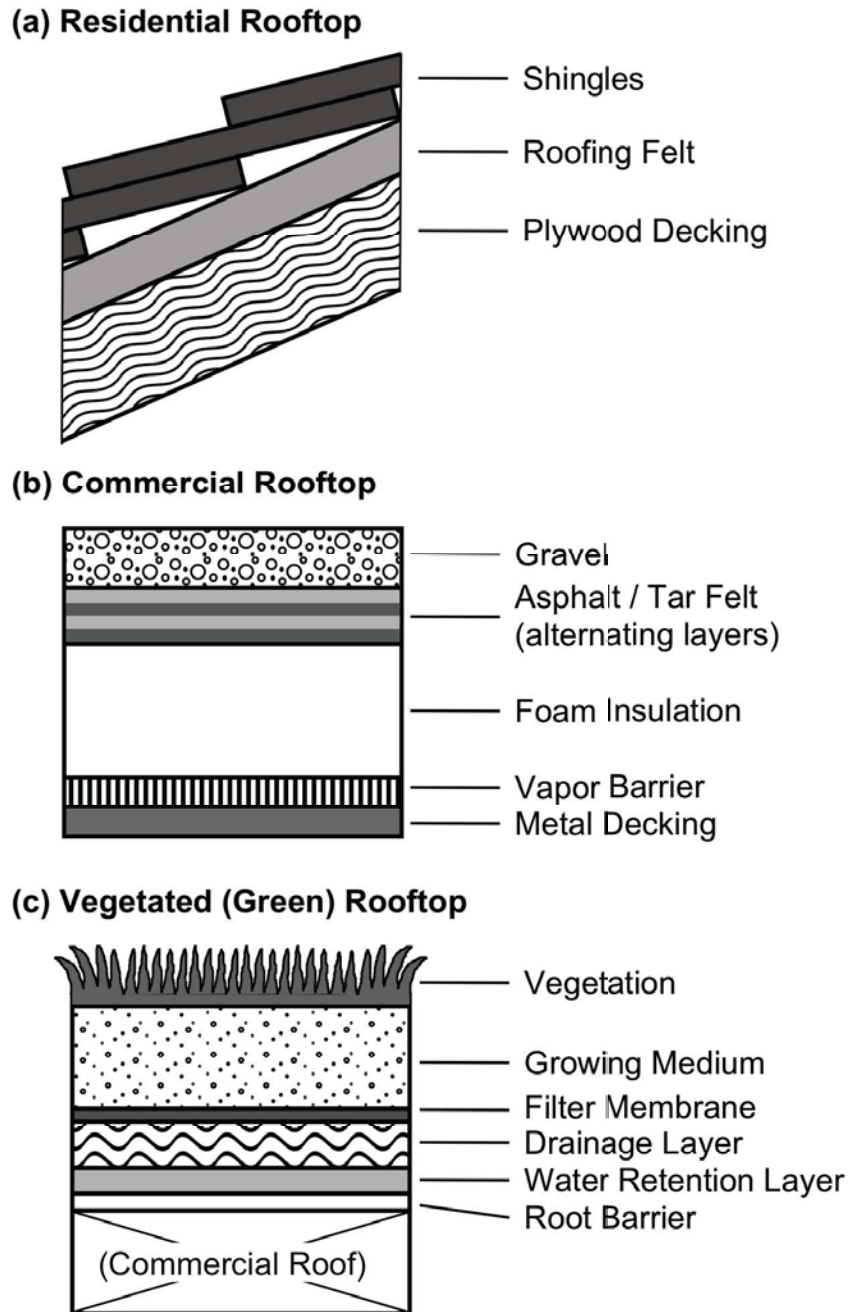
Typical structures of (a) a residential rooftop, (b) a commercial built-up roof, and (c) an 'extensive' green rooftop (not to scale).
